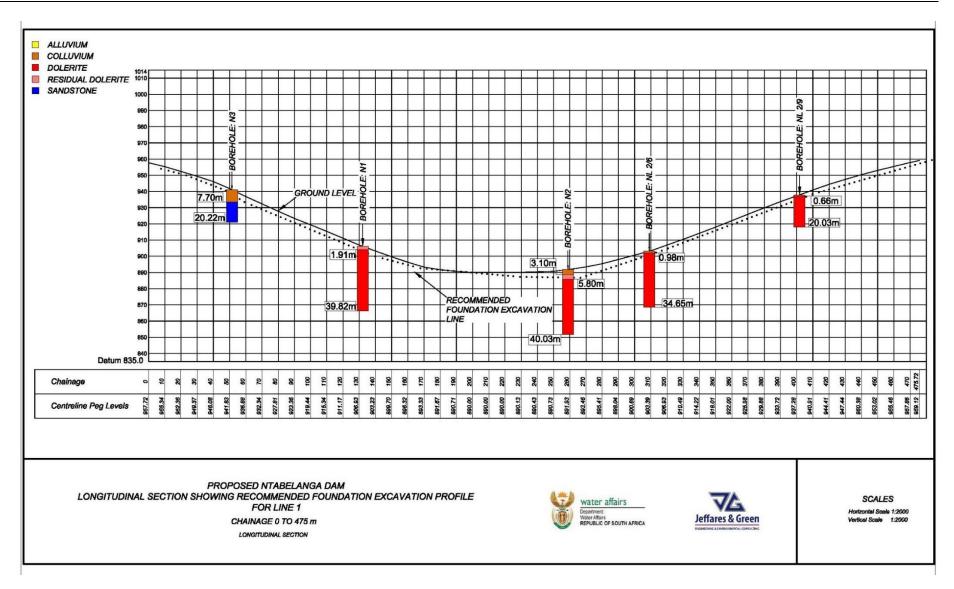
Longitudinal Section - Alignment 1 – Showing Interpretation of Core Drilling Logs
